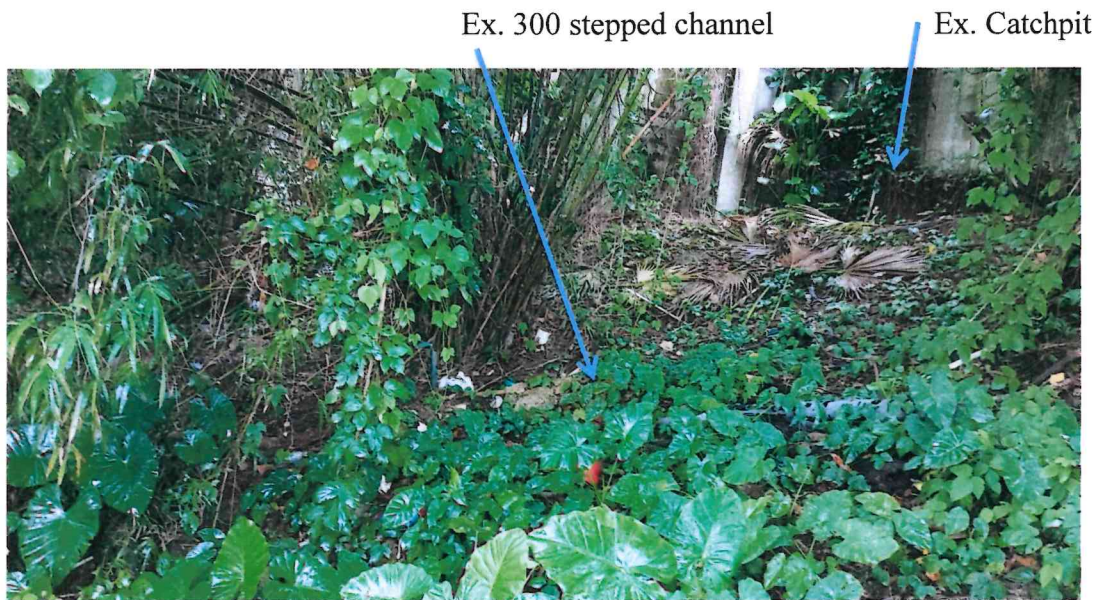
Photo showing the existing 300 stepped channel and catchpit
